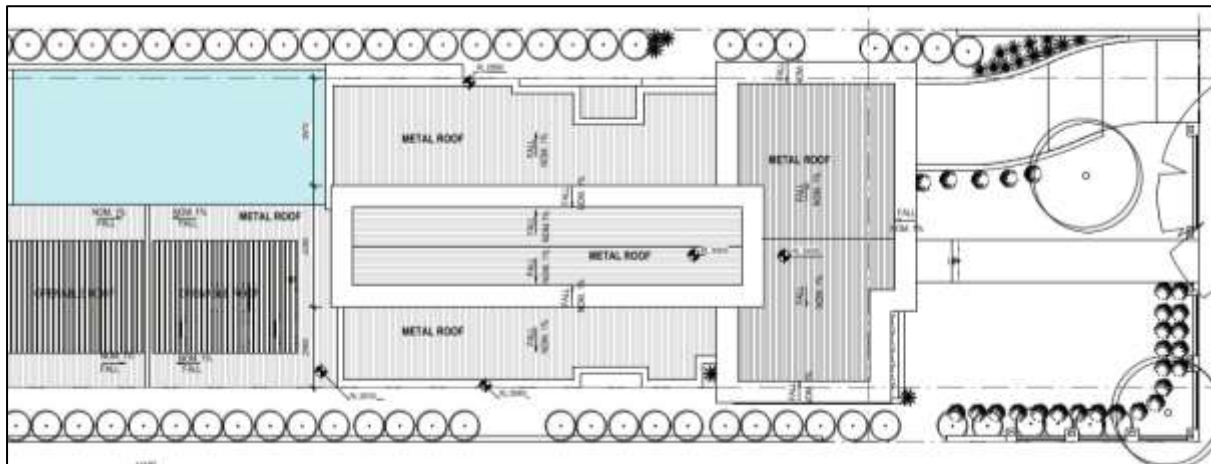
Roof plan of proposed development noting the variation in roof heights across the dwelling.
